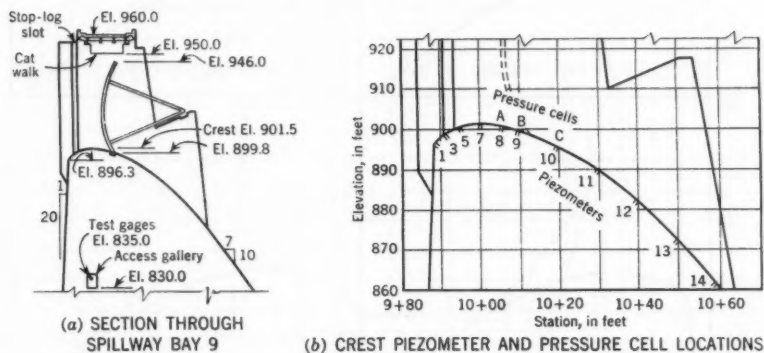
CHIEF JOSEPH DAM, SECTION THROUGH SPILLWAY BAY 9
